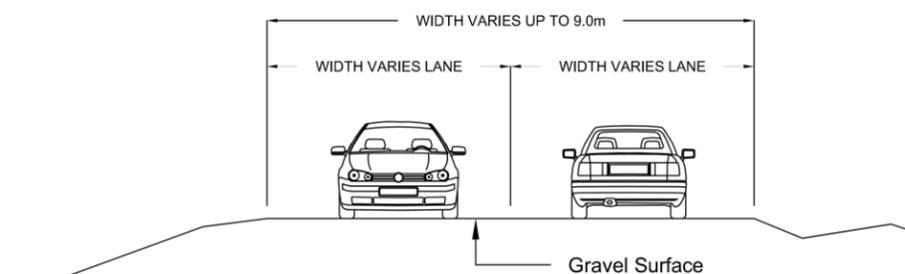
ROUTE 4 - TYPICAL CROSS SECTIONS (LOGGING ROAD)
